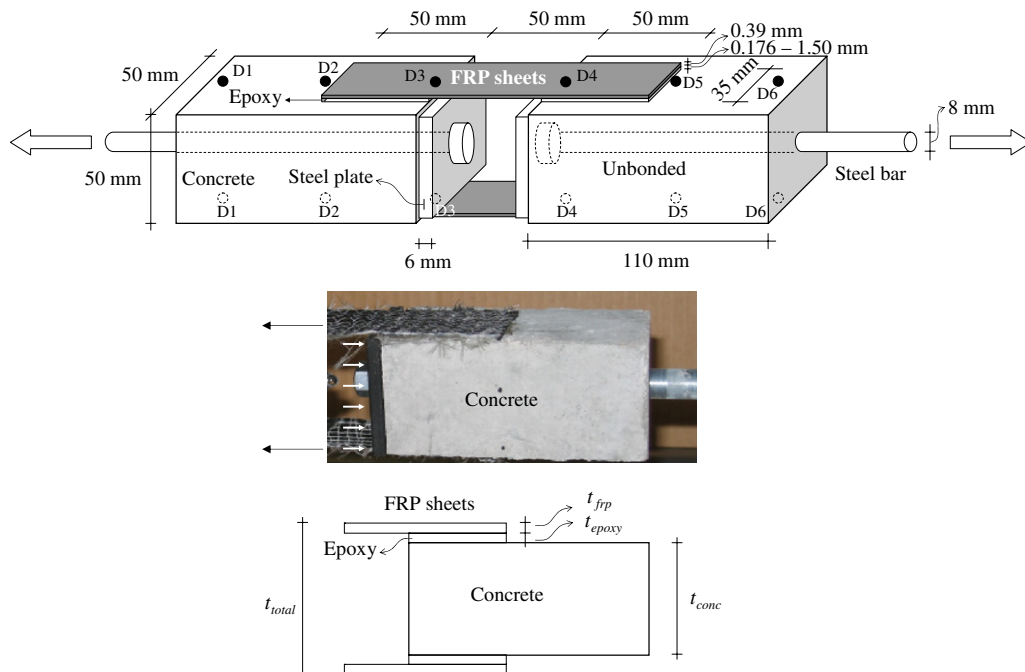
Double-shear test specimens composed of concrete blocks, epoxy and FRP sheets.
